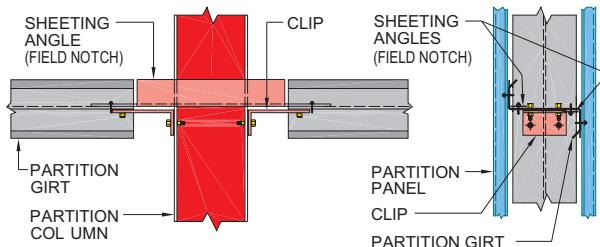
DETAIL-E: PARTITION WALL CONNECTION TO R.F. COLUMN
